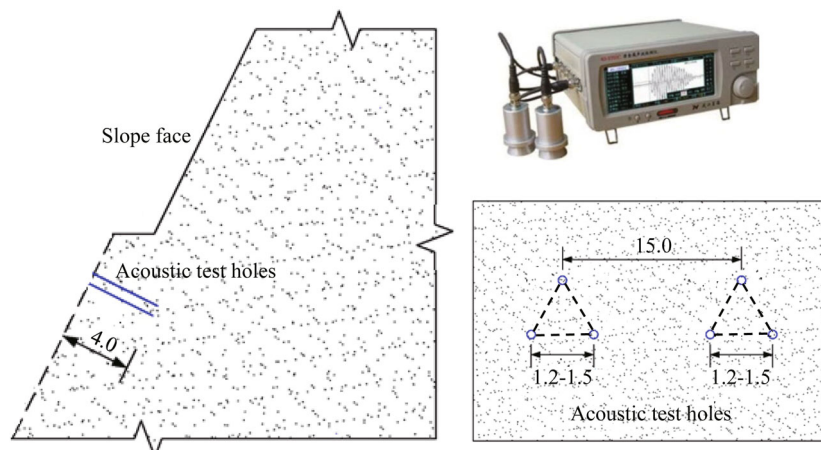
Arrangement of acoustic test holes for the blasting damage testing (units: m)
